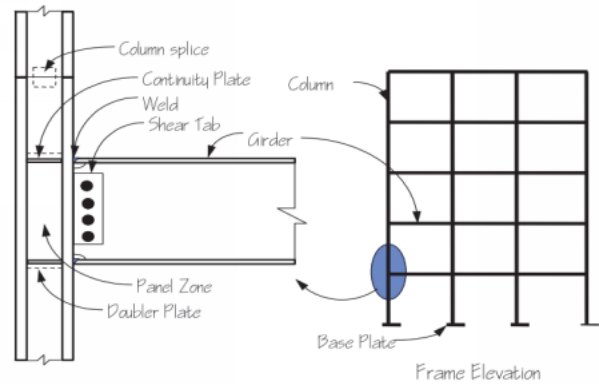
Typical Pre-Northridge WUF Beam-to-Column Connection
